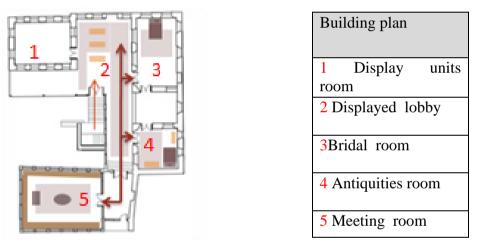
First floor plan of Dervish Pasha Mansion. (Author, 2015, based on Department of Antiquities and Museums original drawings)
